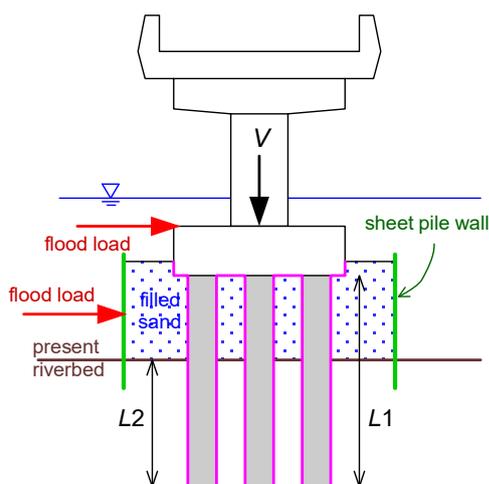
The reinforcement method using Sheet Pile Wall (SPW).
